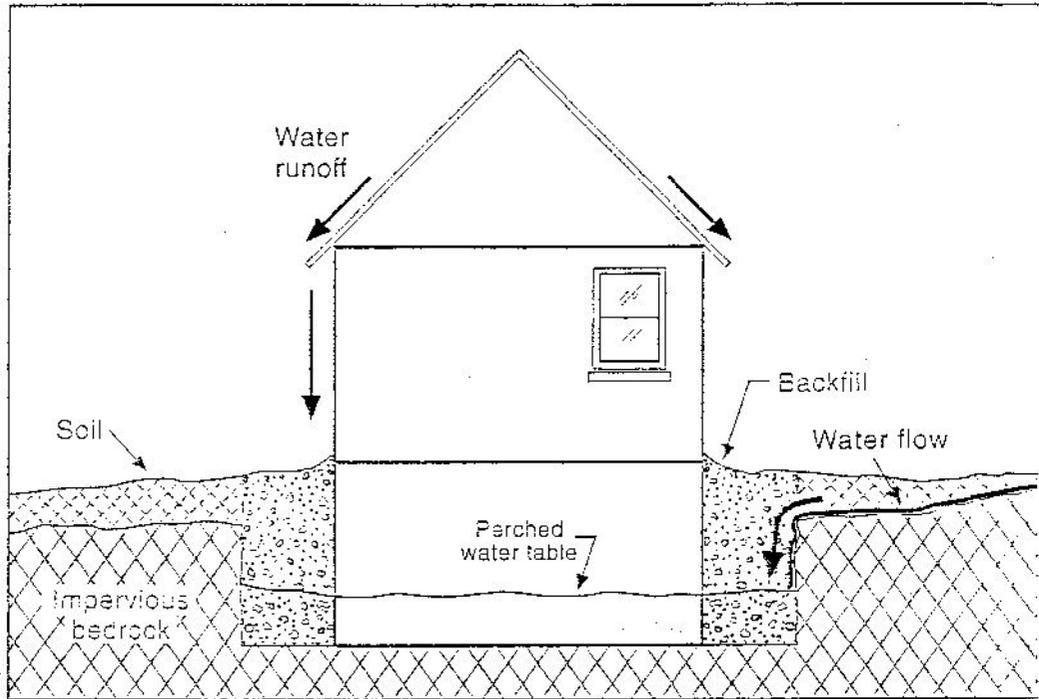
Perched water table in a house excavation dug into impervious bedrock (modified from Jochim, 1987). This is an unwanted situation because runoff water is filling the excavation and infiltrating the bedrock.
